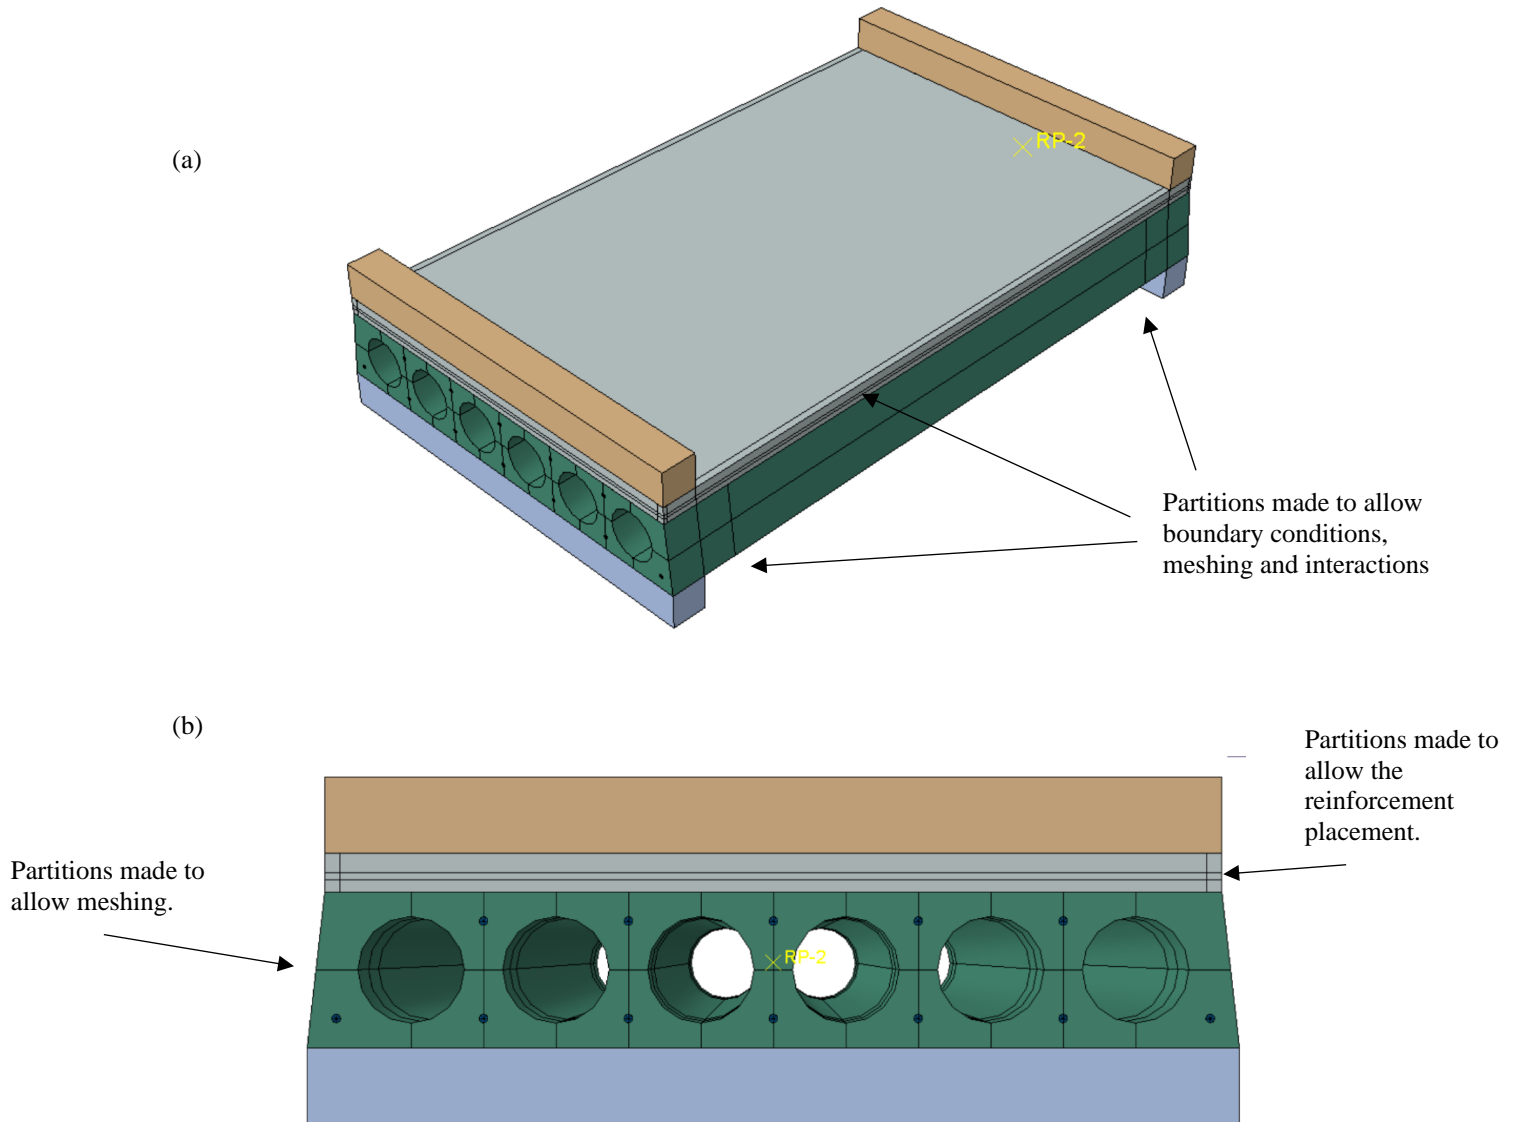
Illustrations of a 203 mm hollow-core (with fixed connection) model assembly. (a) Isometric view. (b) Cross-section view.
